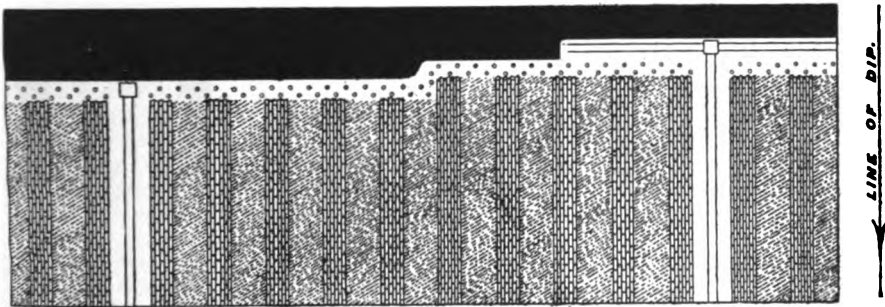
HIGH PARK COLLIERY, LANGLEY MILLS, NOTTS. PLAN SHOWING PART OF TWO STALLS WITH THE PACKWALLS, IN THE TOP HARD COAL SEAM.
